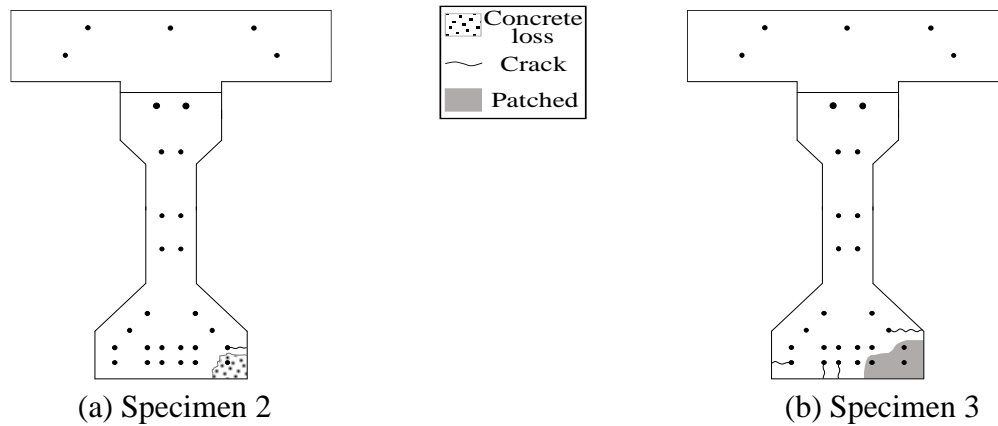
Typical observed damage for girders with an I-section
